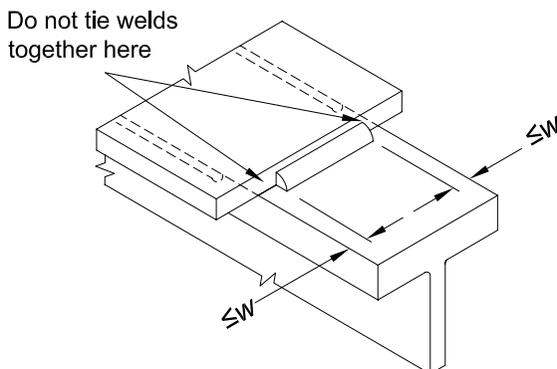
Details for fillet welds that occur on opposite sides of a common plane.
